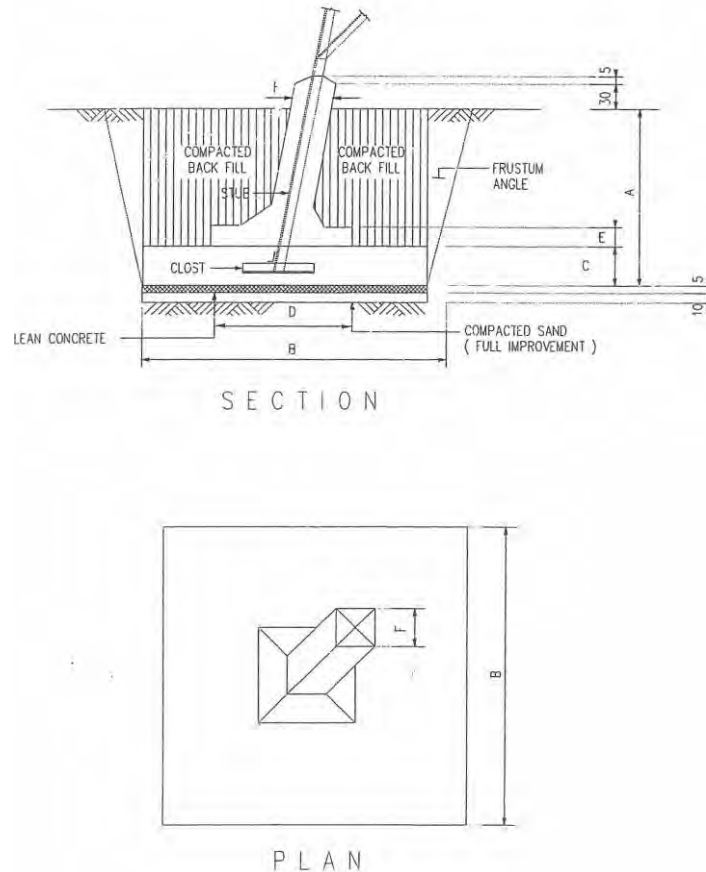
5 500 kV T/L Foundation Type Pad and Chimney
